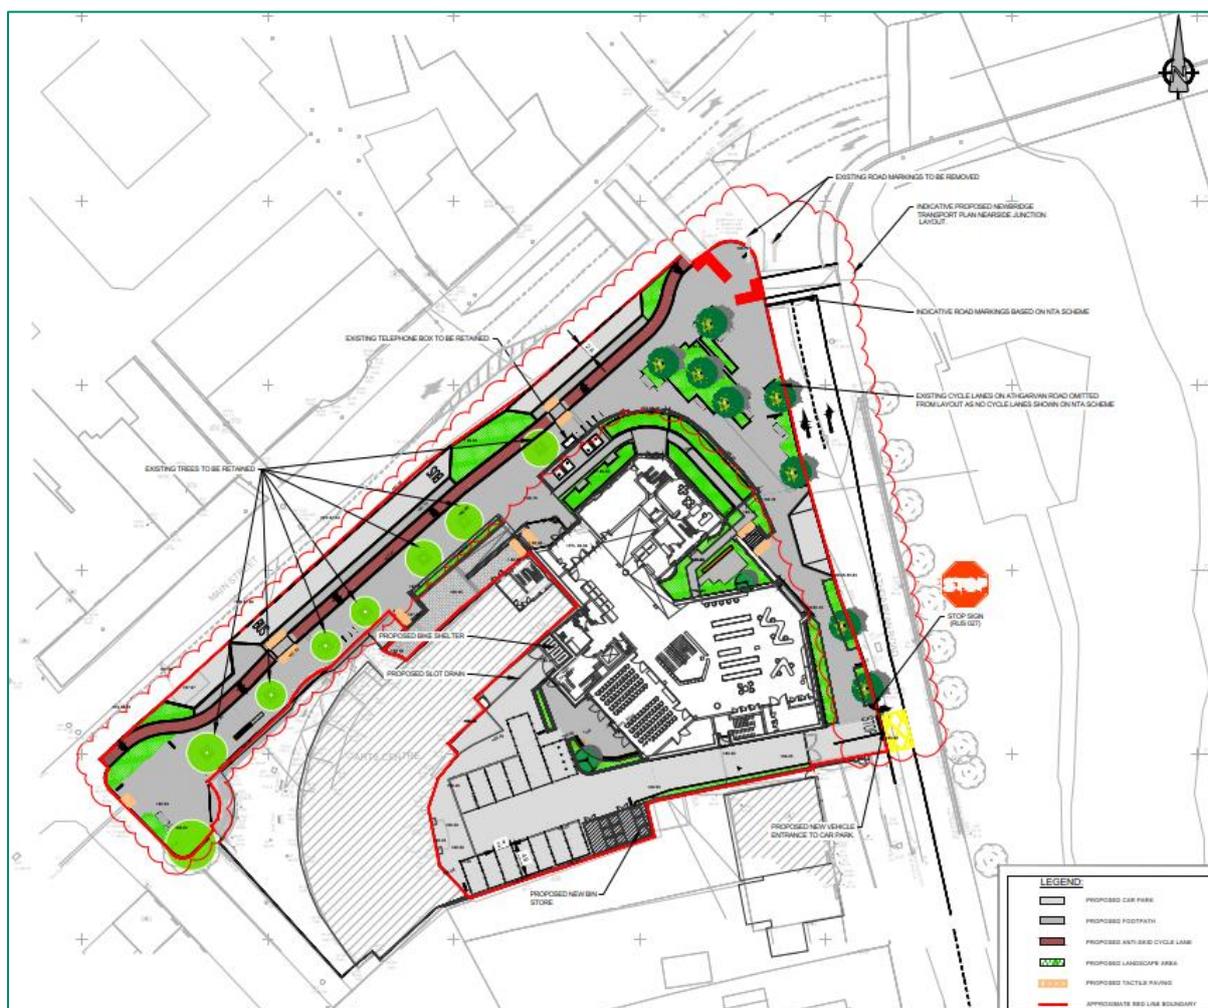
Proposed General Arrangement (Source: AECOM Drawing 60669624-ACM-XX-00-DR-CE-10-0001)
